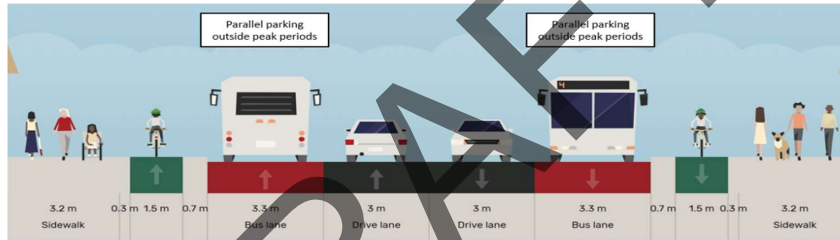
Option 2 – Hutt Road Indicative Plan and Cross Section
